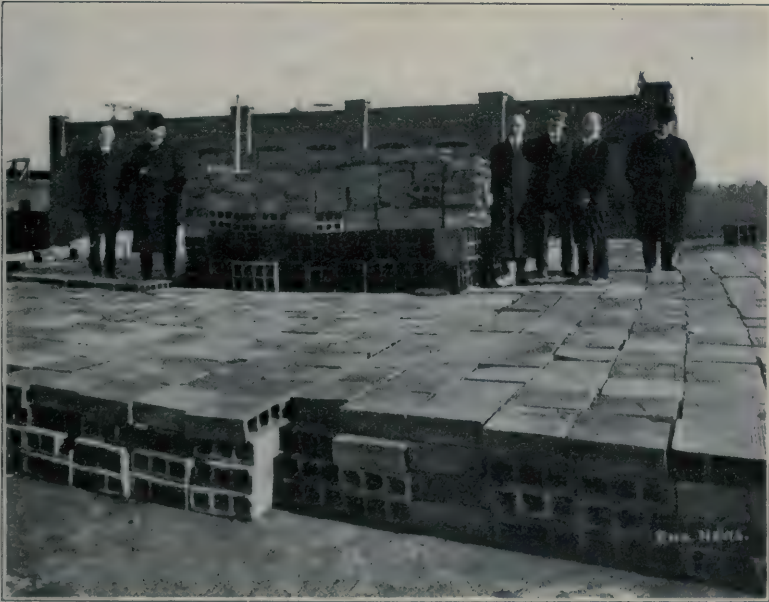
Test on roof of Eastman Kodak Co. building made after the concrete had been given more time to harden.
